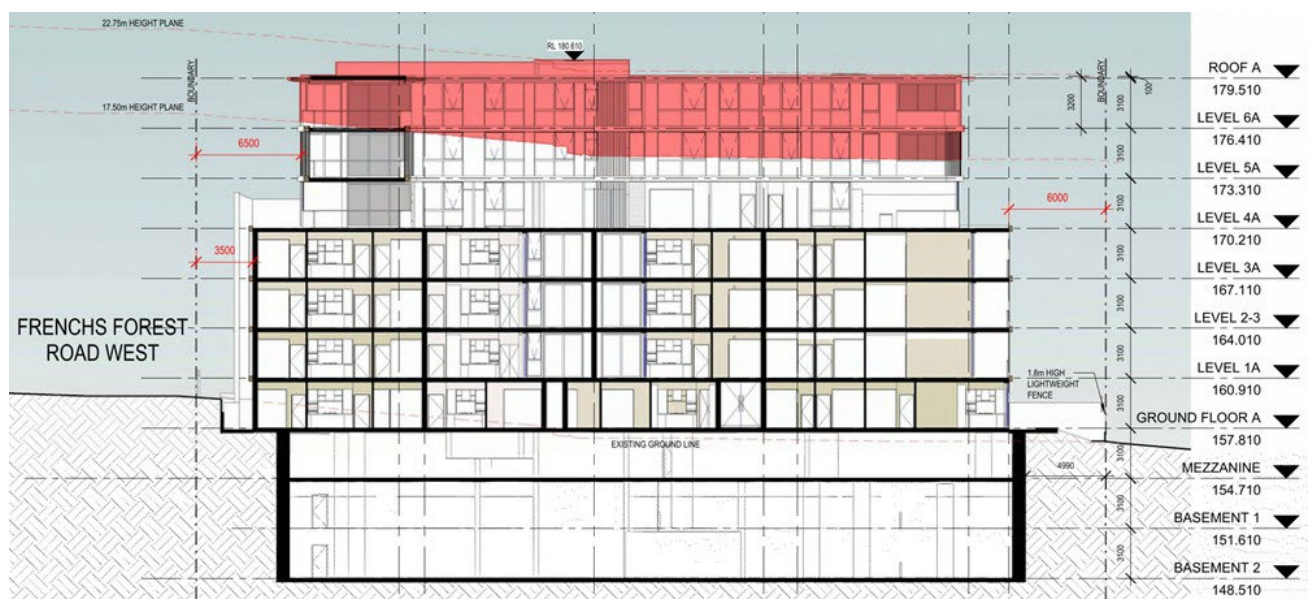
Council calculation of the proposed Building A breach of the WLEP building height standard (shaded red)
